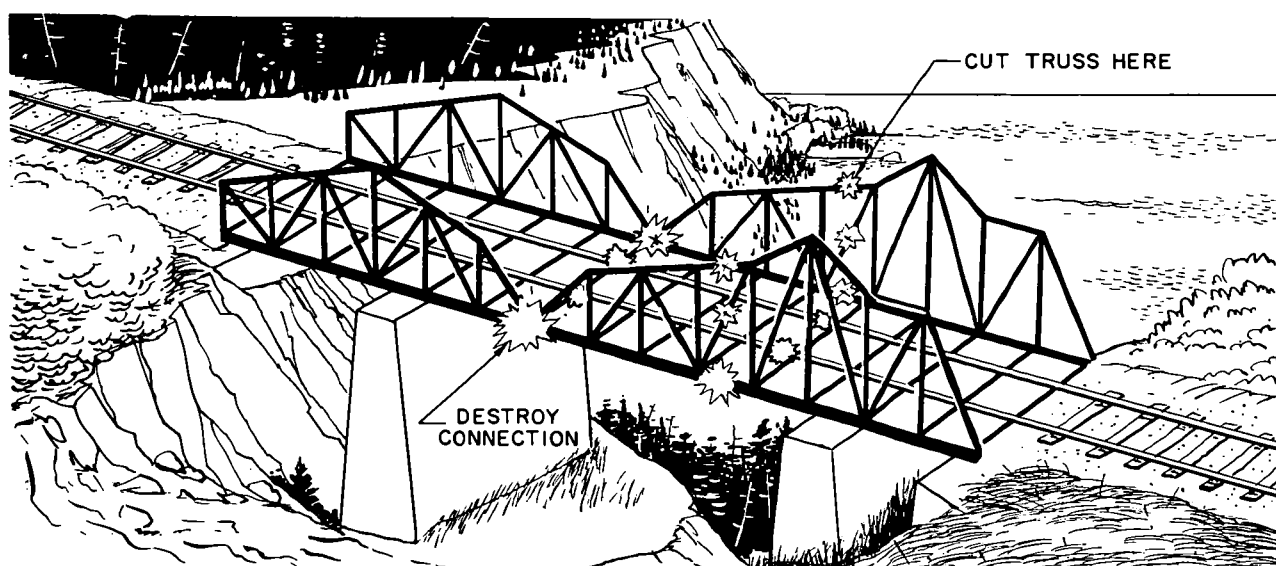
Partial destruction of cantilever truss without suspended span.
